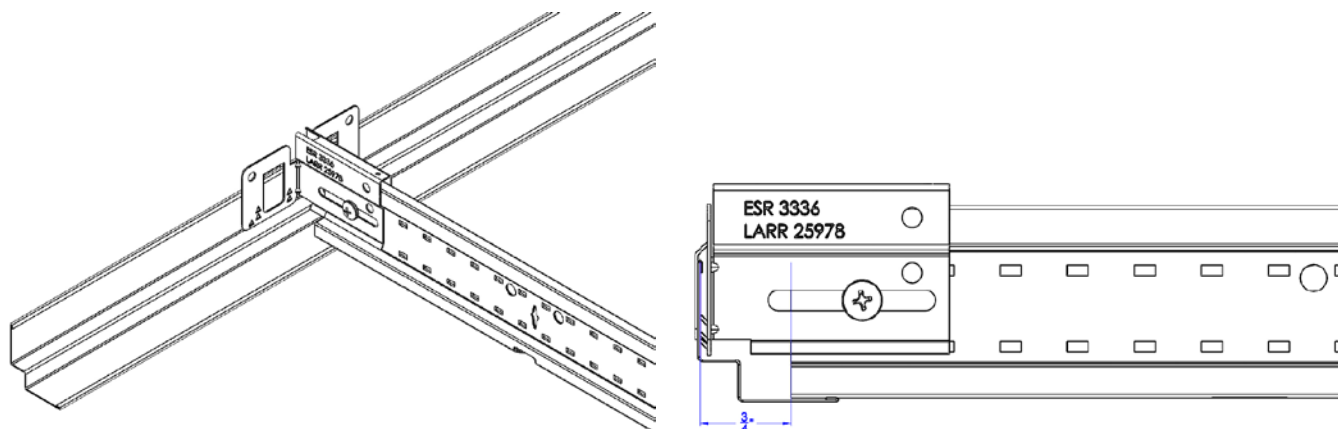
B—SEISMIC PERIMETER CLIP (CTSPC-2 WITH TWO SCREW ATTACHMENT) FREE WALL SETUP FOR SEISMIC DESIGN CATEGORIES D, E AND F IN SECTION 4.2.2 (SHADOW MOLDING SM1040 AND SM1050)
